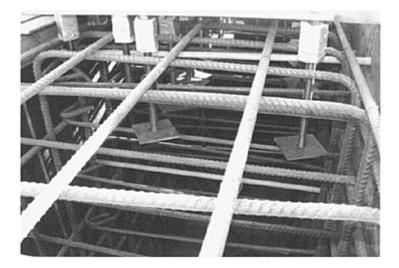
Detail of the foundation block, with tie down bolts for buffers and guide rails.
